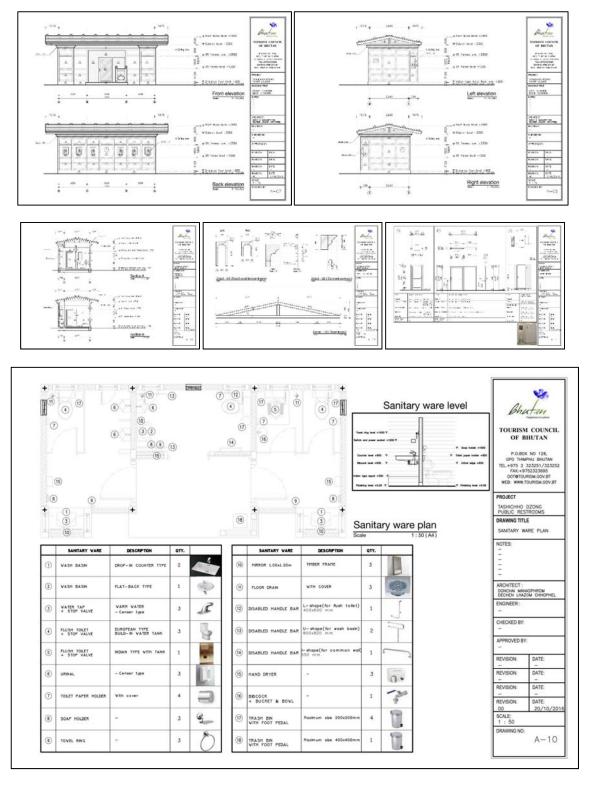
Construction drawings of Tashichho Dzong tourists lounge.
